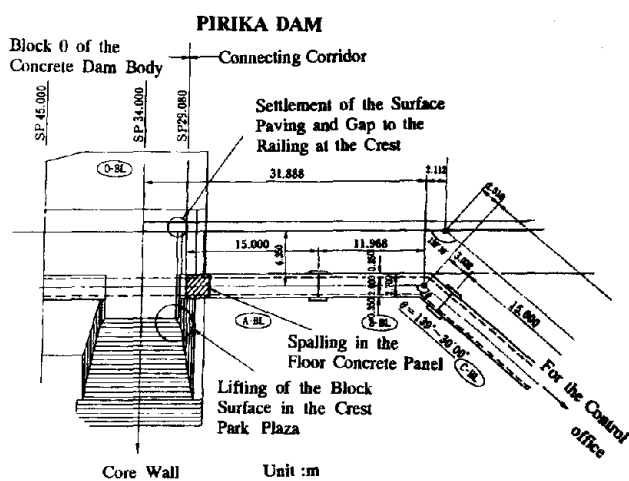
Longitudinal Section of Deformed Locations Between Block 0 and the Connecting Corridor at Parika Dam
